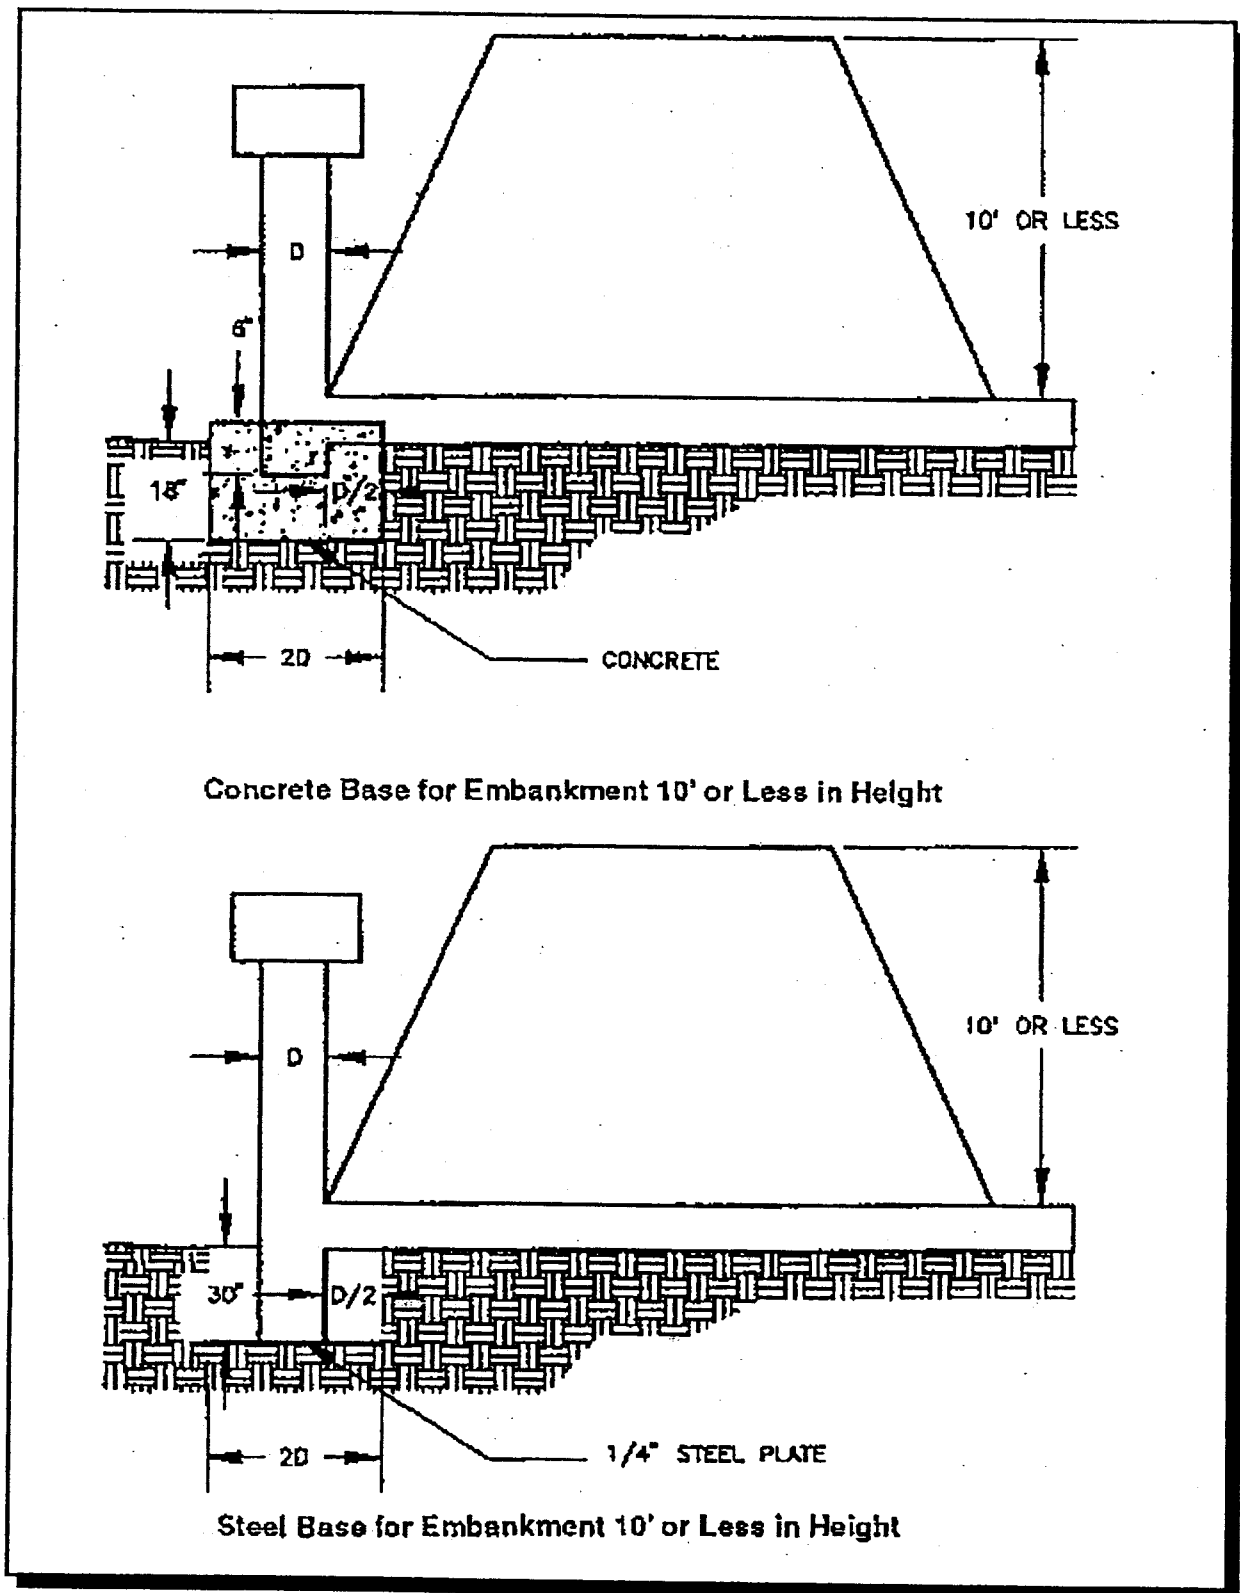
Riser Pipe Base Conditions for Embankments Less than 10 Feet High
